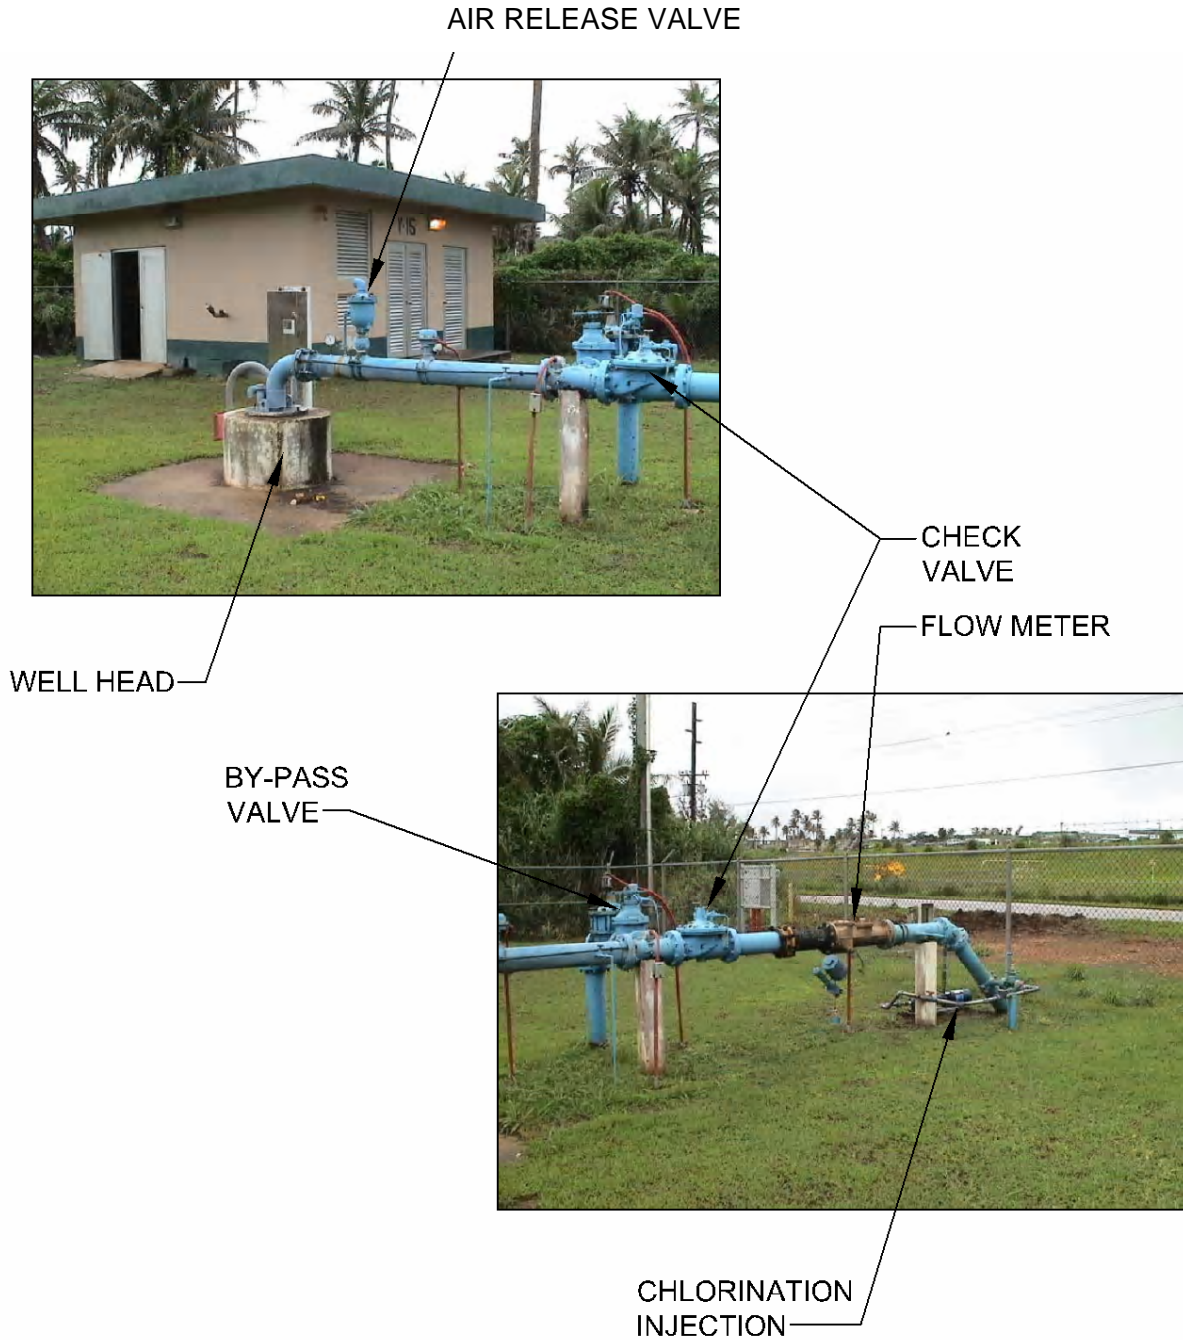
Typical Well Indoor Chlorination System Installation
